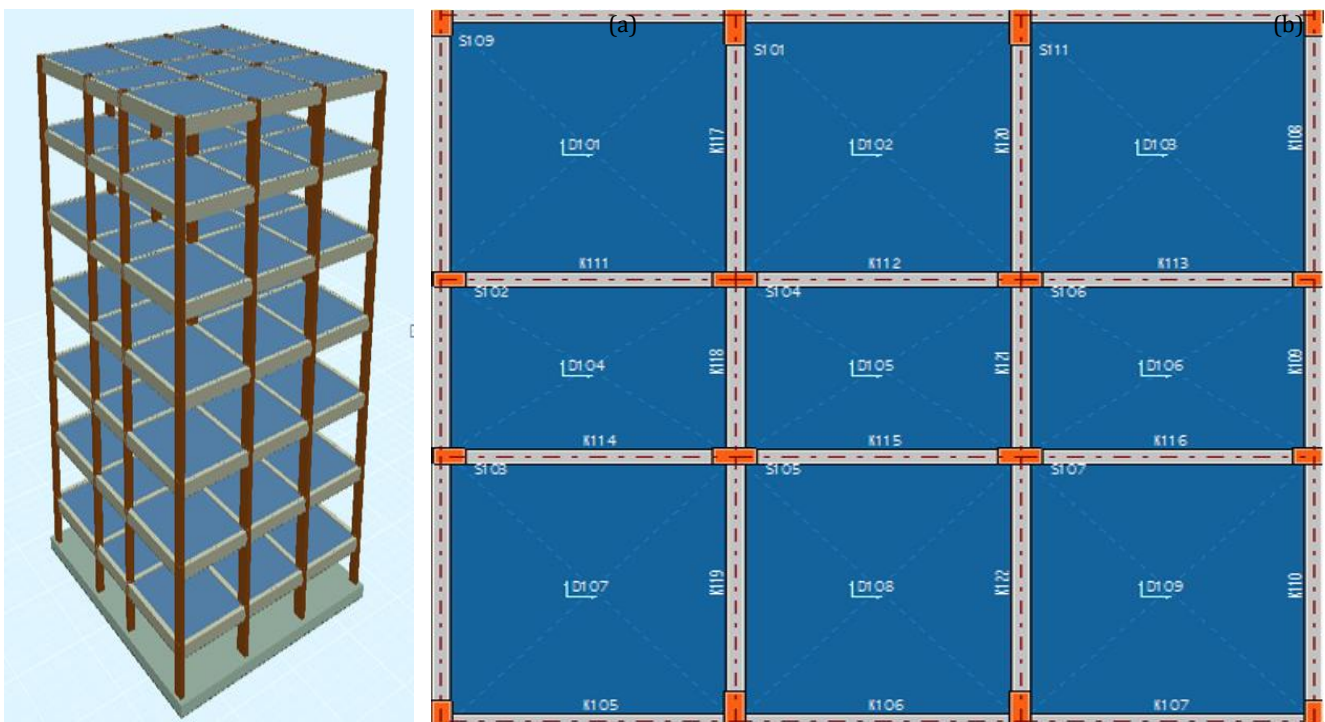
(a) 3-D plan (b) of the 7-storey frame model.
